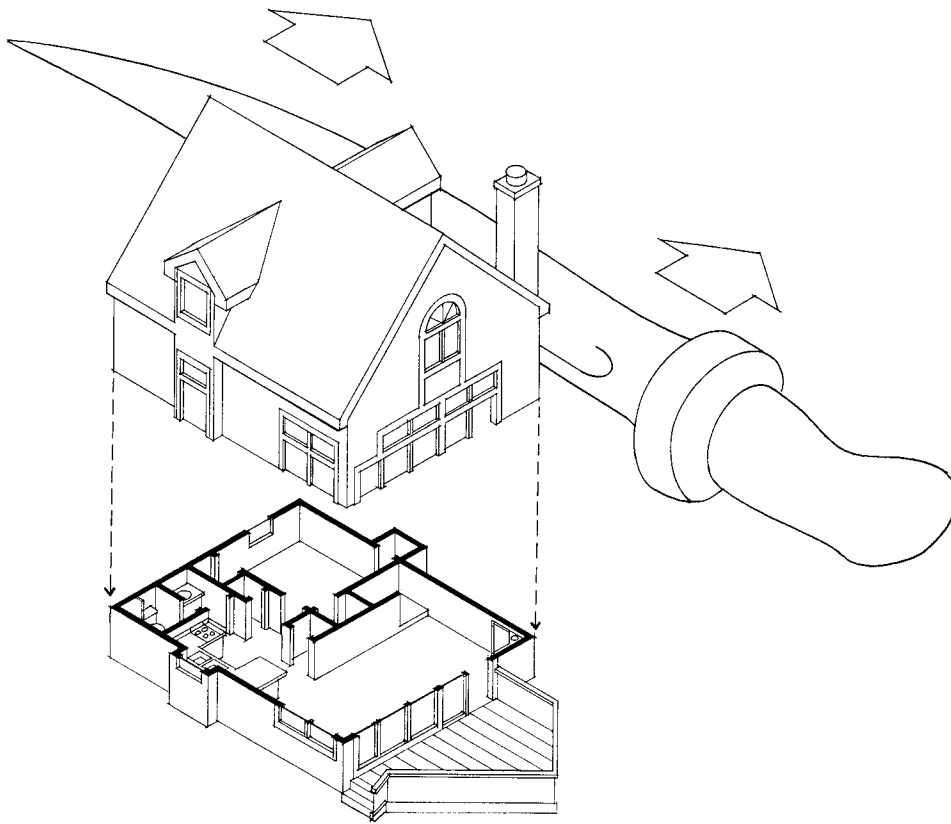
A floor plan view is created by slicing horizontally through a building.
